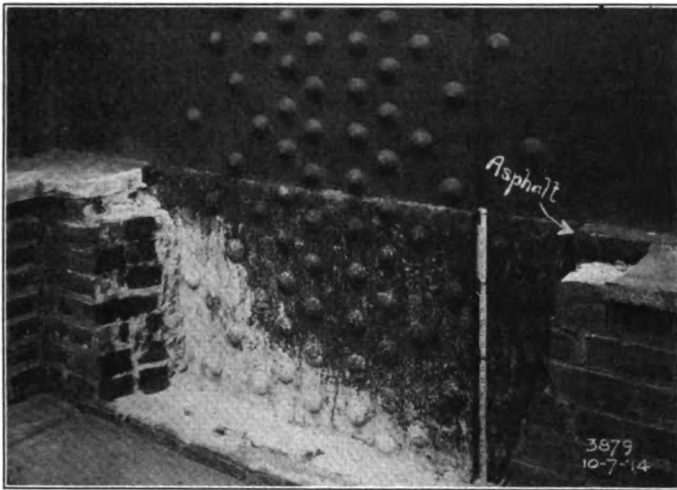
Holder tank plates of open hearth steel with portion of brick and concrete wall removed. No corrosion where concrete was in close contact. Holder built in 1908.
